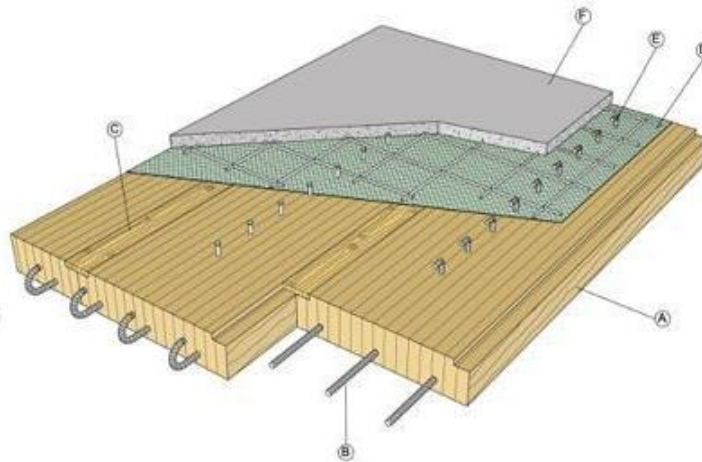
The Armalam® glulam beams for timber floors. © <https://www.armalam.it/travi-armalam/>
